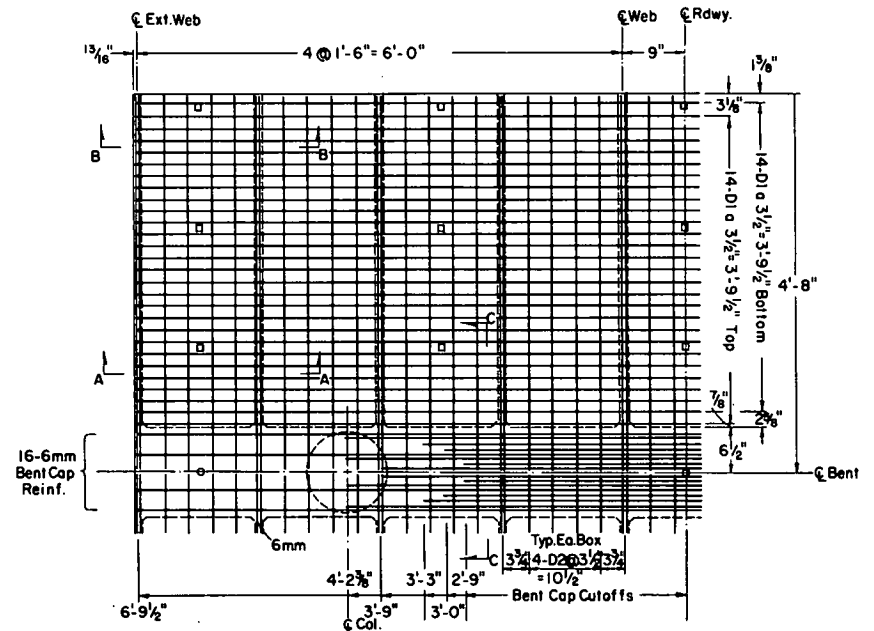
Plan of Bottom Slab Reinforcement and Bottom Bent Cap Reinforcement for DC-9
